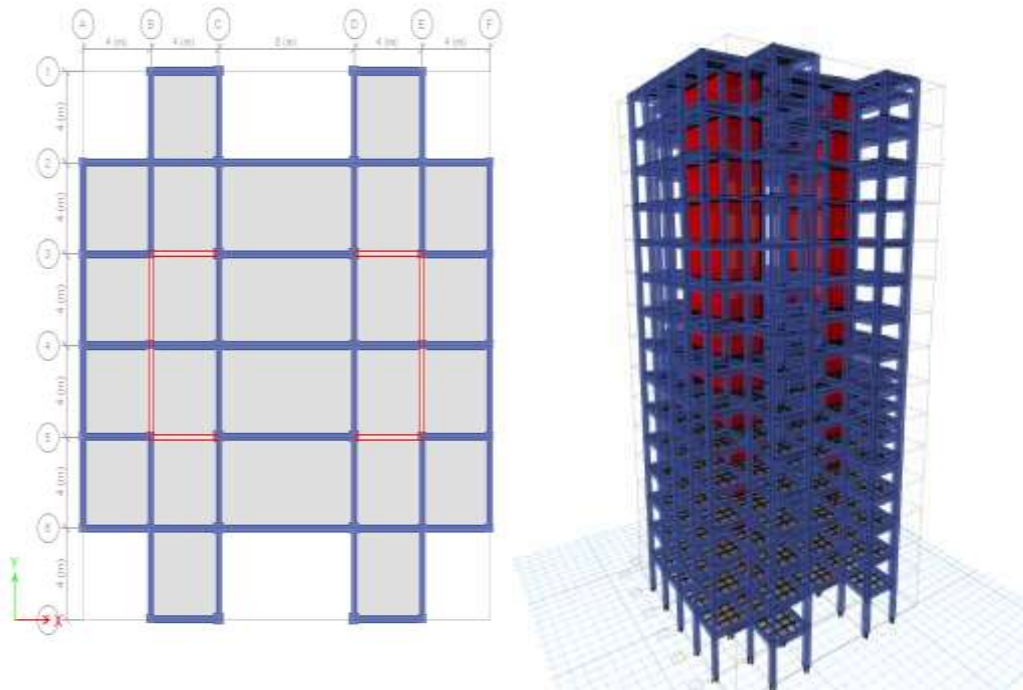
Model 2 Regular building with C Shape shear wall at Inner Edge.
